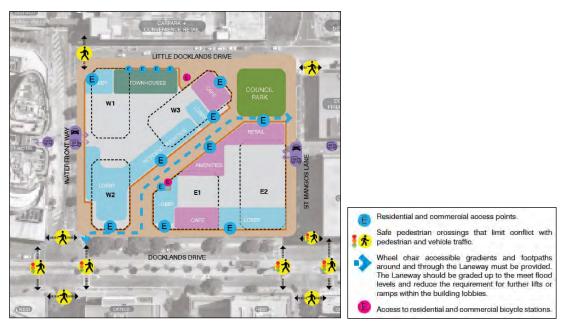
Proposed DP Section 5.3 (Pedestrian Access Plan)
